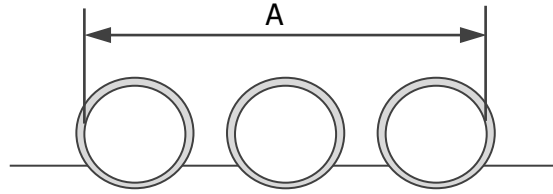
Profile view of a multi-pipe bridge under fill, or culvert-under fill.
